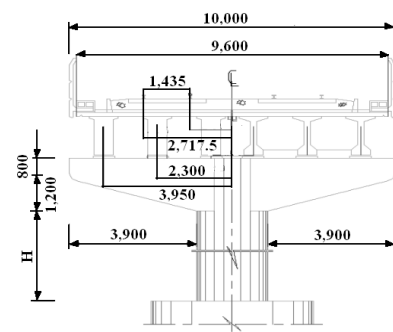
Structural configuration of the elevated bridge on #3 region (unit : mm)
